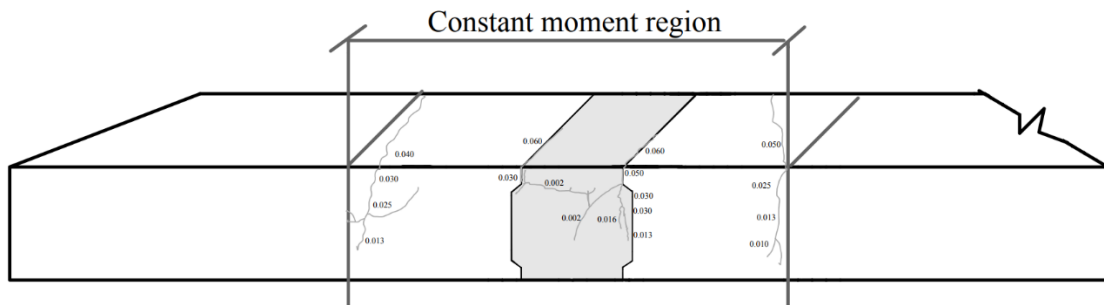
Crack Propagation for Non-Proprietary Short-Term Specimen at 90 % of Final Load
